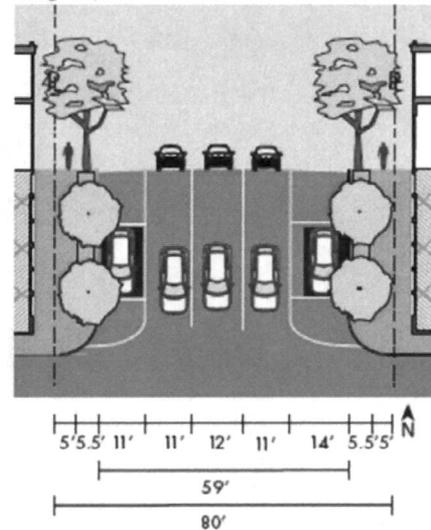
The North Beach Master Plan identified one-way streets as an issue.
